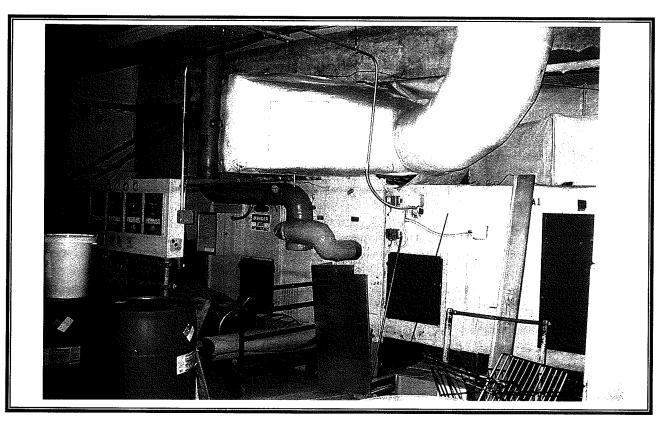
Photo Date 12/05/06 Midtown Tower - 3-rd Floor Mechanical Room PA-1 Air Handling Unit, 44 years old. Steam heating coil is disconnected and abandoned in place.
